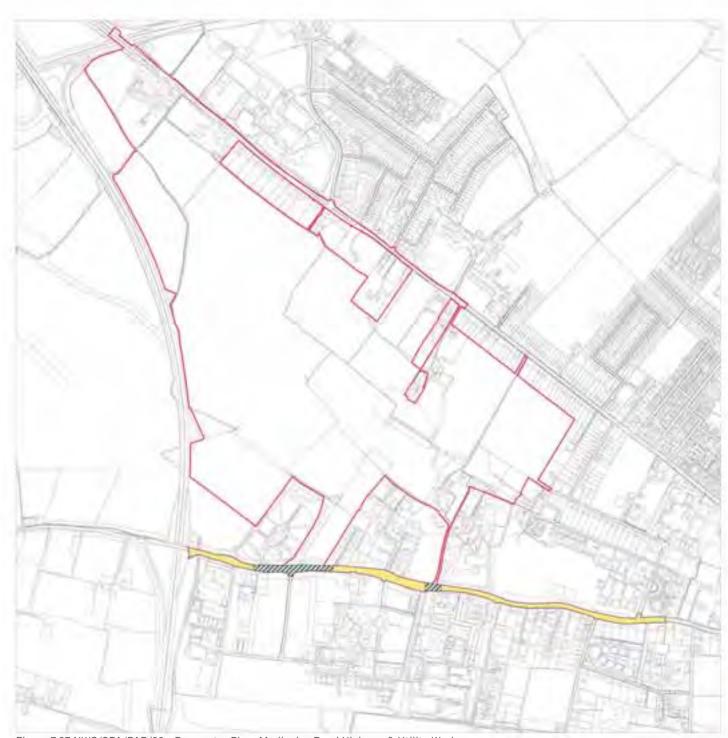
NWC/OPA/PAR/09 - Parameter Plan: Madingley Road Highway & Utility Works
